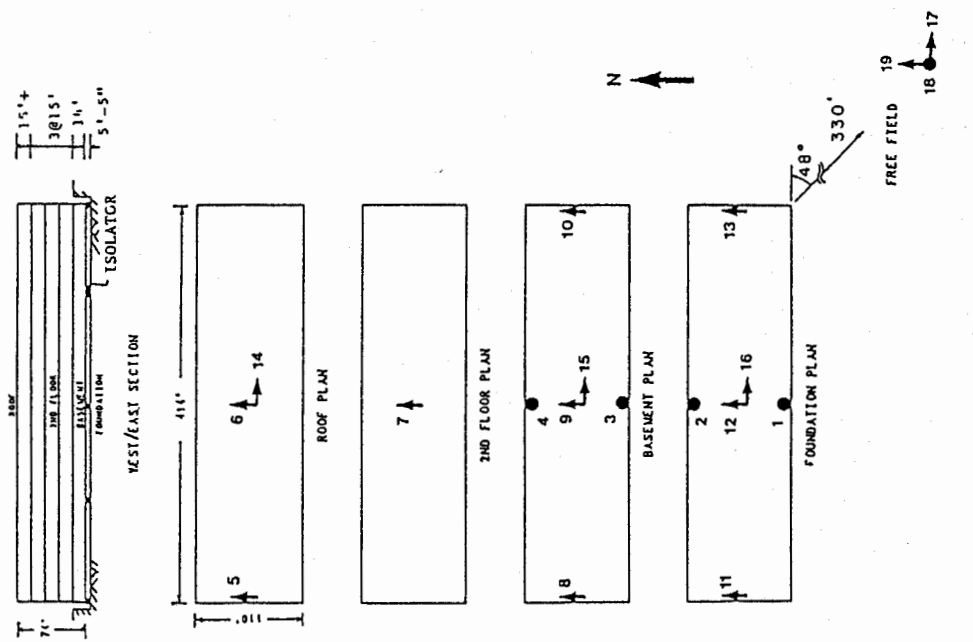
FCLJC Plan and Elevation with Instrumentation Layout
